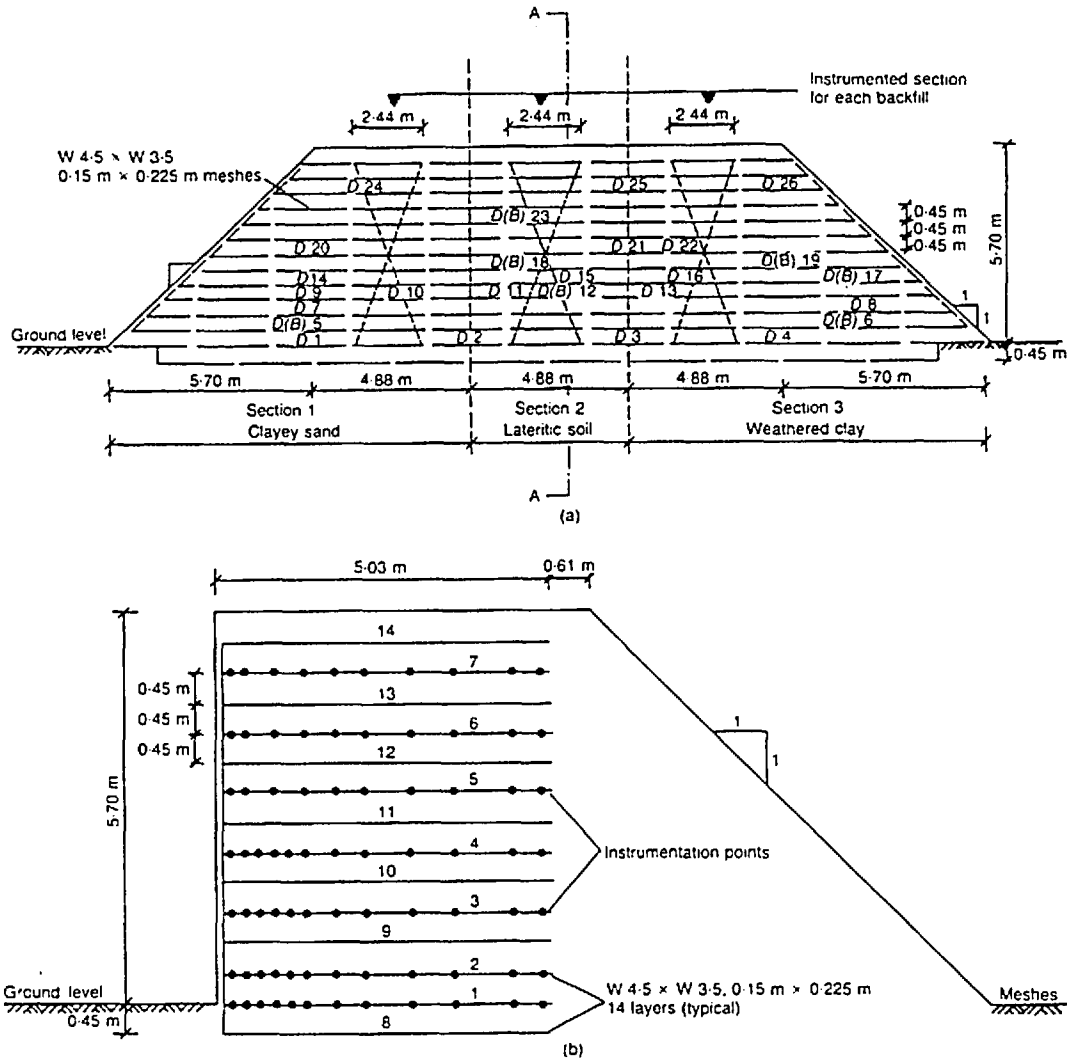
Views of the welded wire wall: (a) front-sectional; (b) cross-sectional (only mats 1-7 are instrumented)
